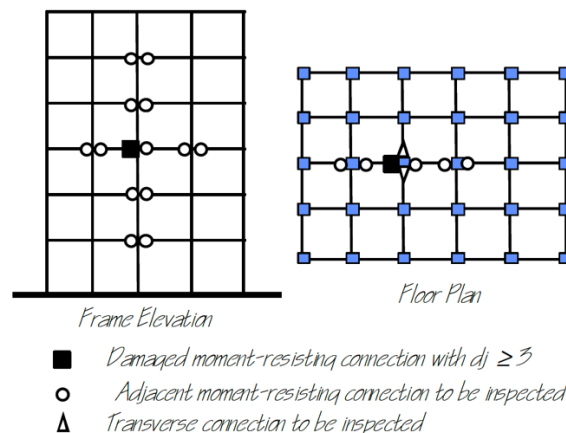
Inspection of Connections Adjacent to Damaged Connection ($d_j \geq 3$)
